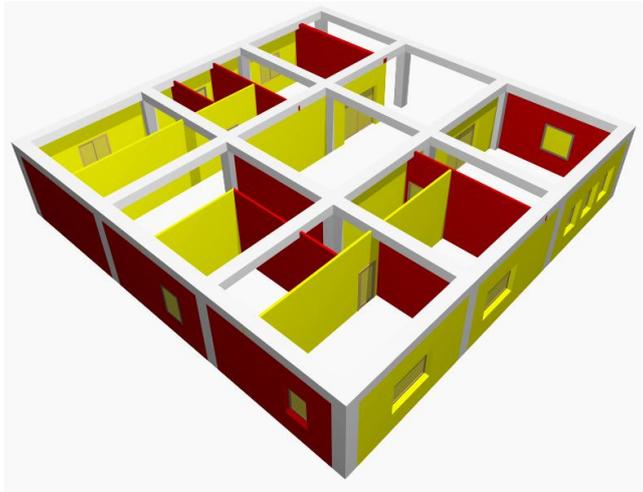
First floor 3D damage visualization at $S_a(T_1) = 0.3g$.
